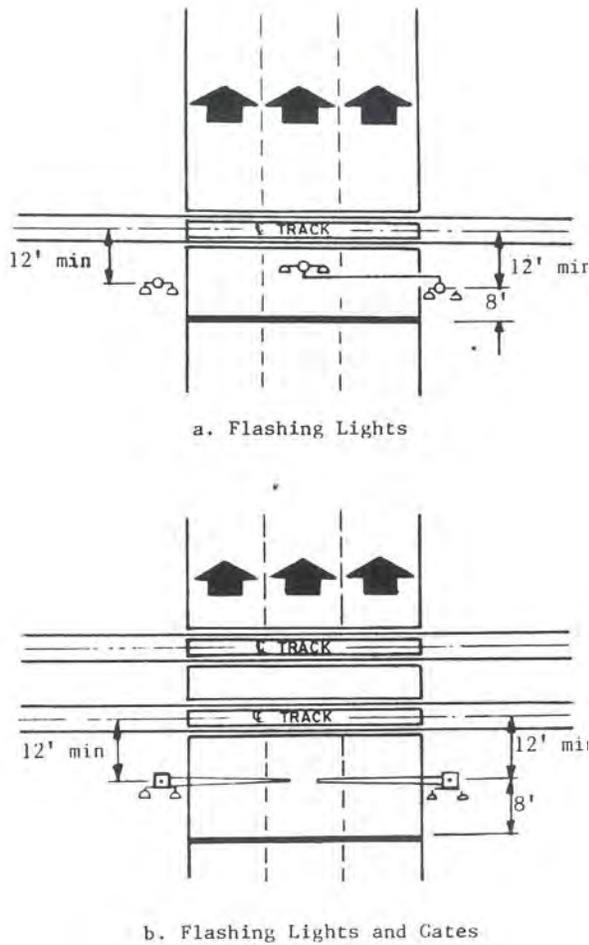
Typical Location Plan, Right Angle Crossing, One-Way, Two Lanes
